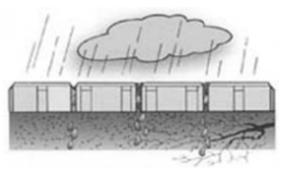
Permeable Pavement - for water drainage: Installed in closed assembly with spacer on stone. Joints filled with gravel
